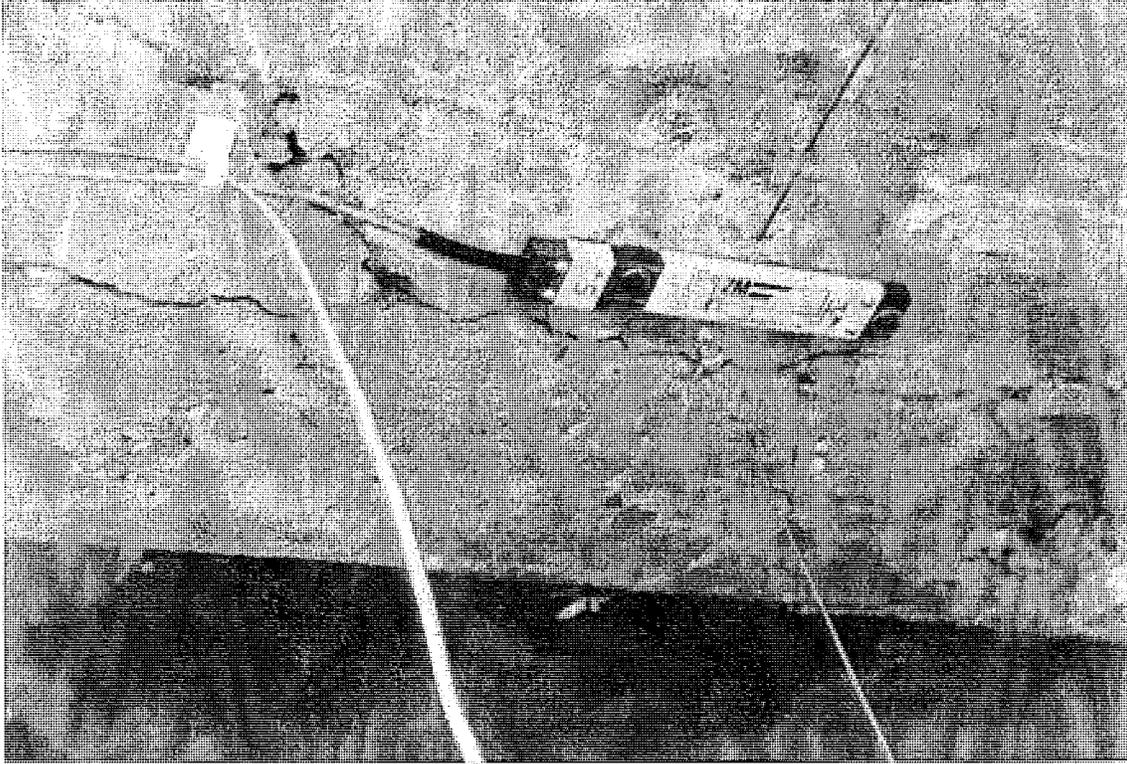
Typical Strain Transducer Setup for Bridge No. 1.
